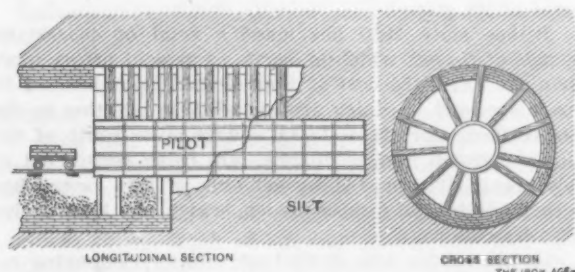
Sections through Heading, Showing Use of Pilot.
